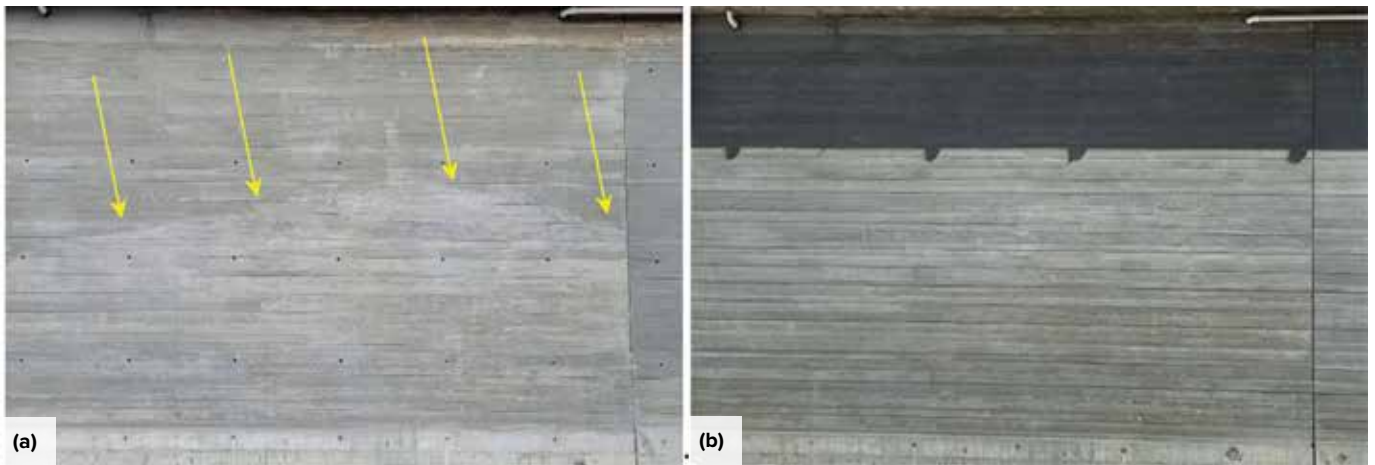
A board formed surface constructed using self-consolidating concrete: (a) arrows indicate a line between two placements of concrete; and (b) the same surface after cleaning, patching, and toning
